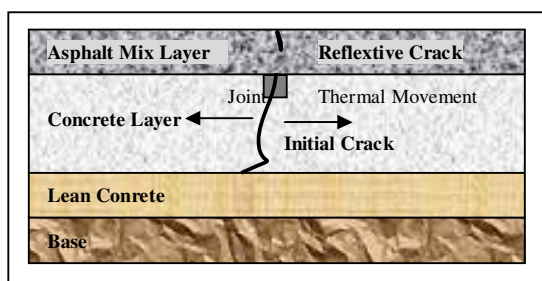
The mode of reflection crack development on rigid pavement
